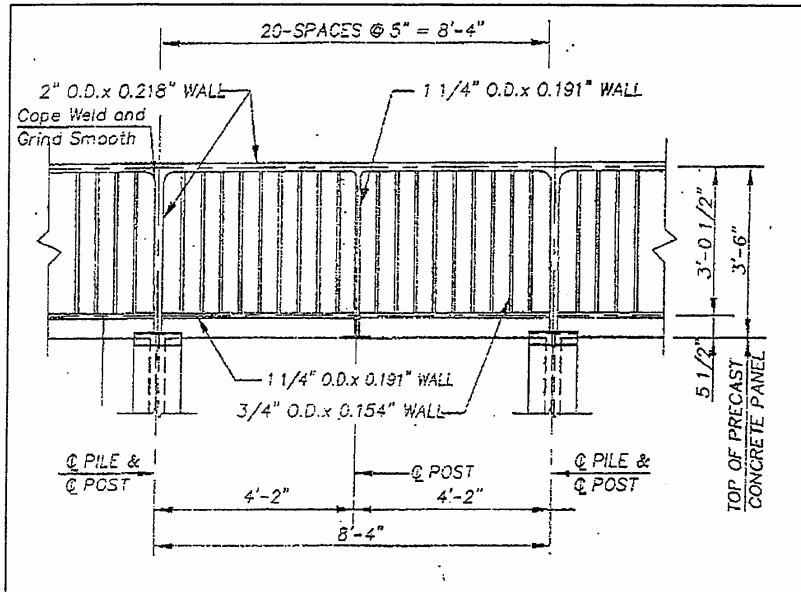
Typical Example of a Composite Wall Design (Source: CBBEL Files)
